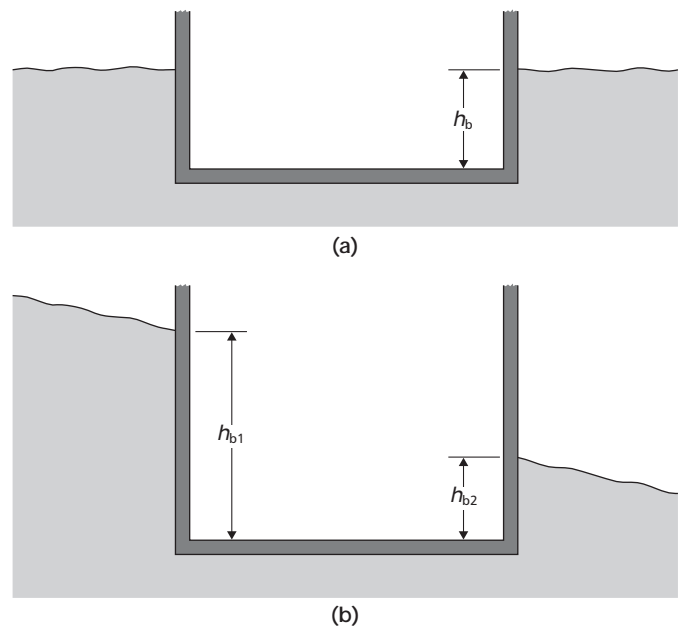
Depth of basement; (a) building on level site, (b) building on sloping site
